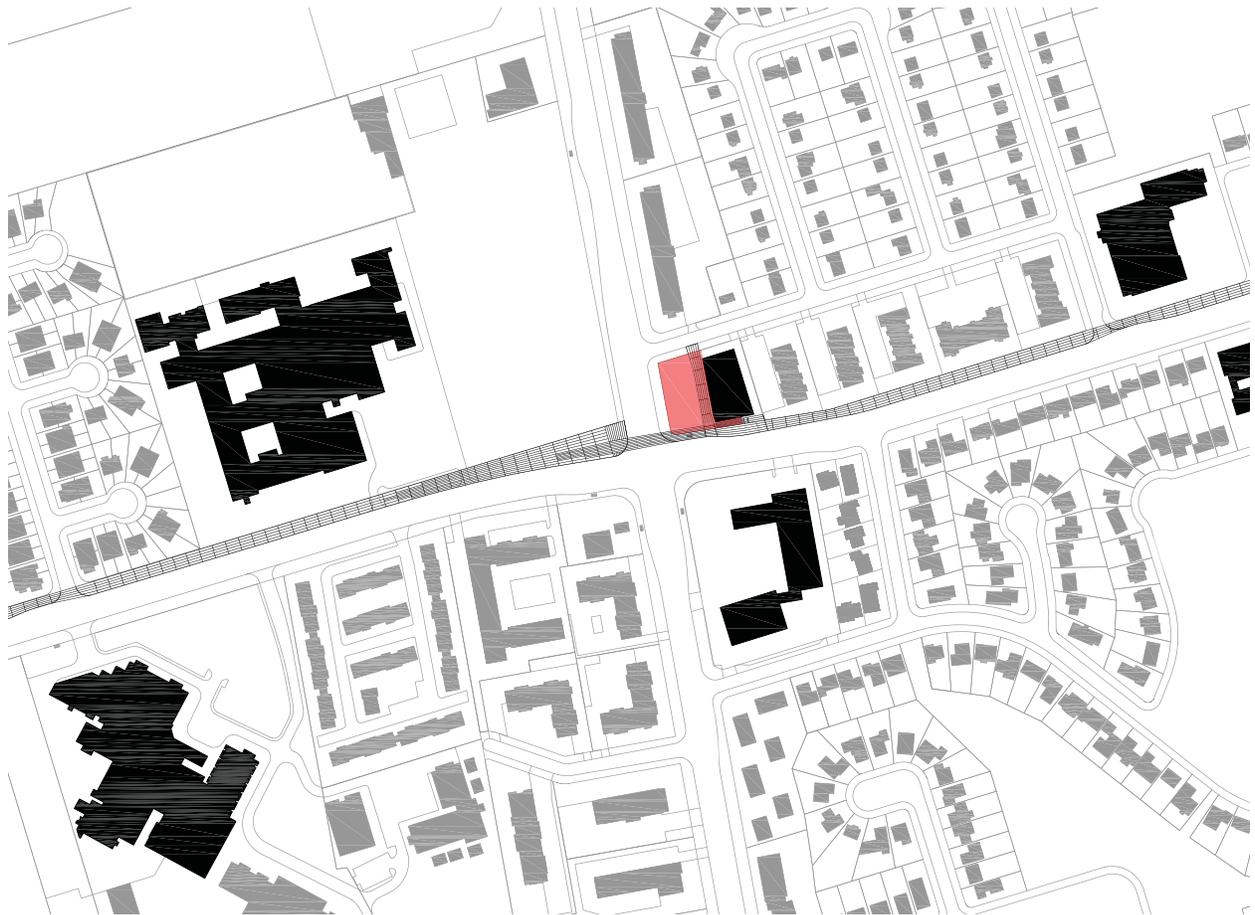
Site plan indicating the location of the strip mall intervention
